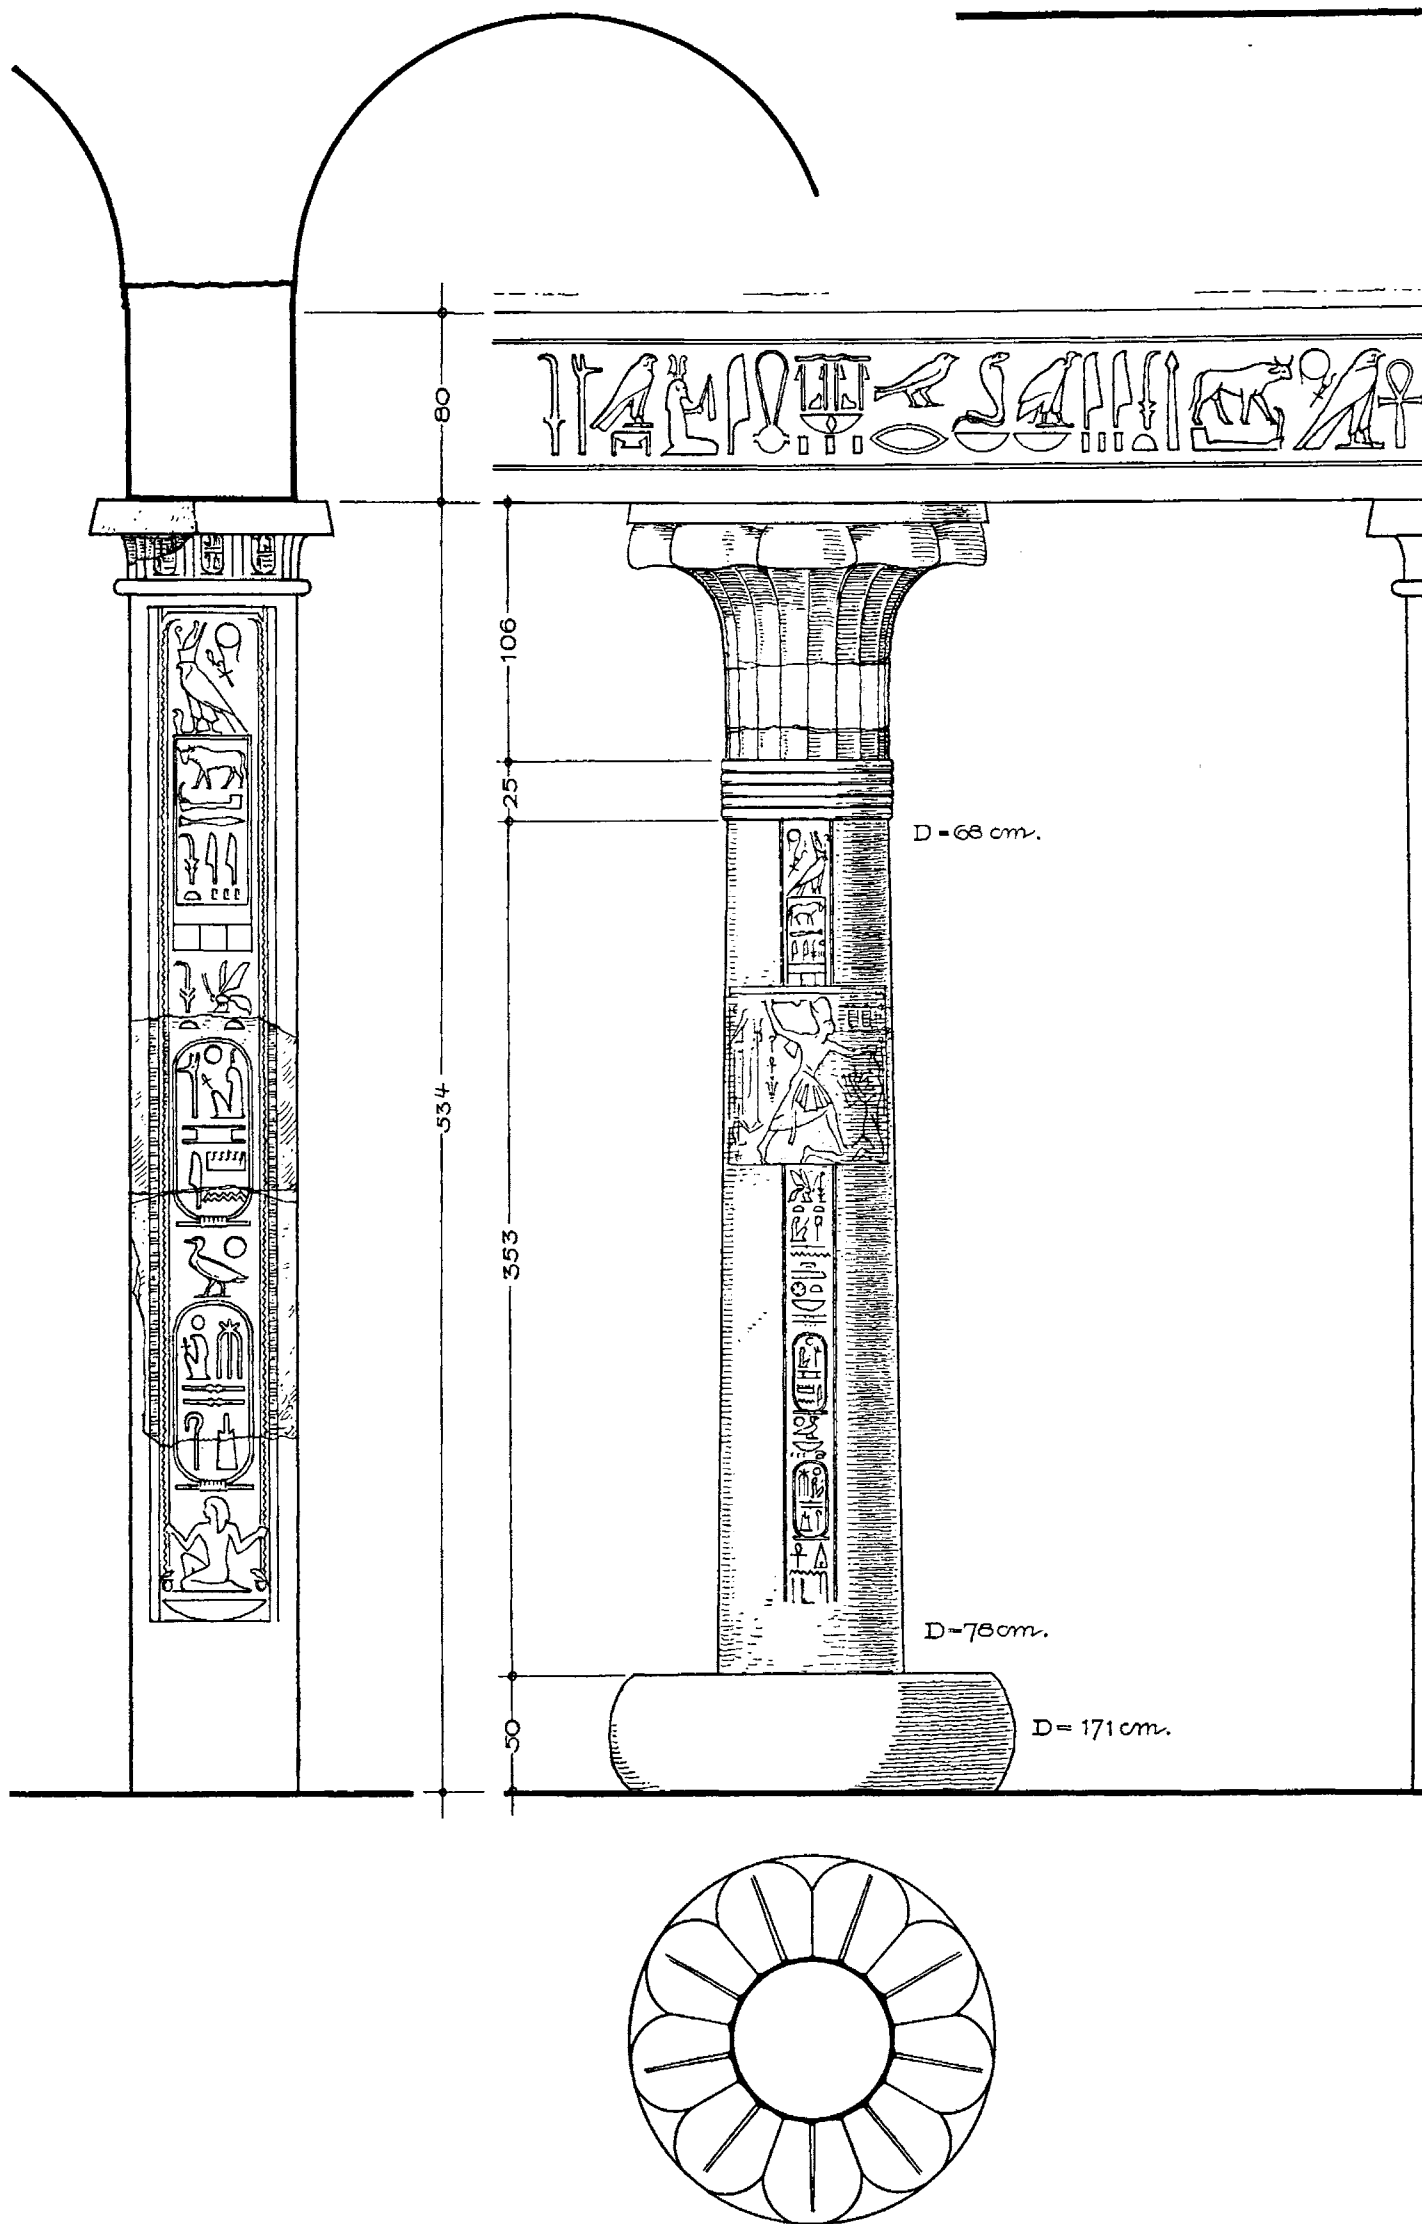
COLUMN, PILASTER, AND BEAM IN THE GREAT COLUMNED HALL OF THE FIRST PALACE. RECONSTRUCTION
